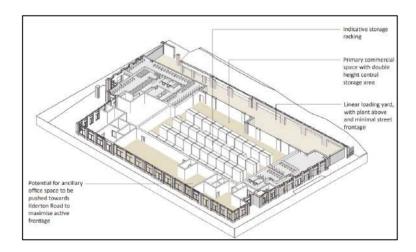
Cutaway of the ground floor of Ilderton Road, with main commercial space highlighted. Design features enhance the flexibility of the industrial floor space, allowing the units to accommodate a variety of potential occupiers (Source: Maccreanor Lavington)
